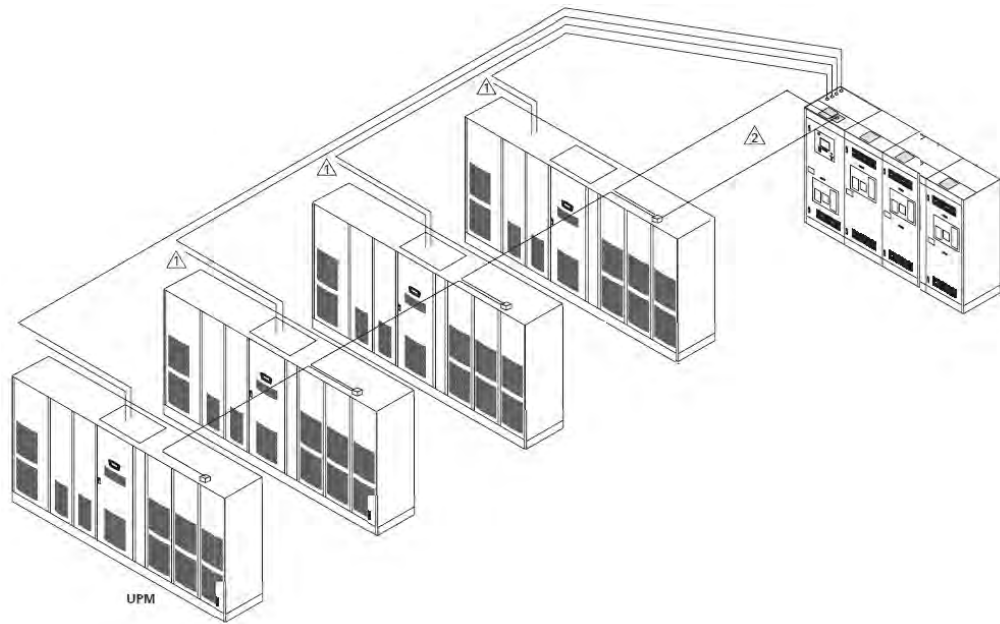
Typical SUPS parallel system layout (Eaton Corporation)
